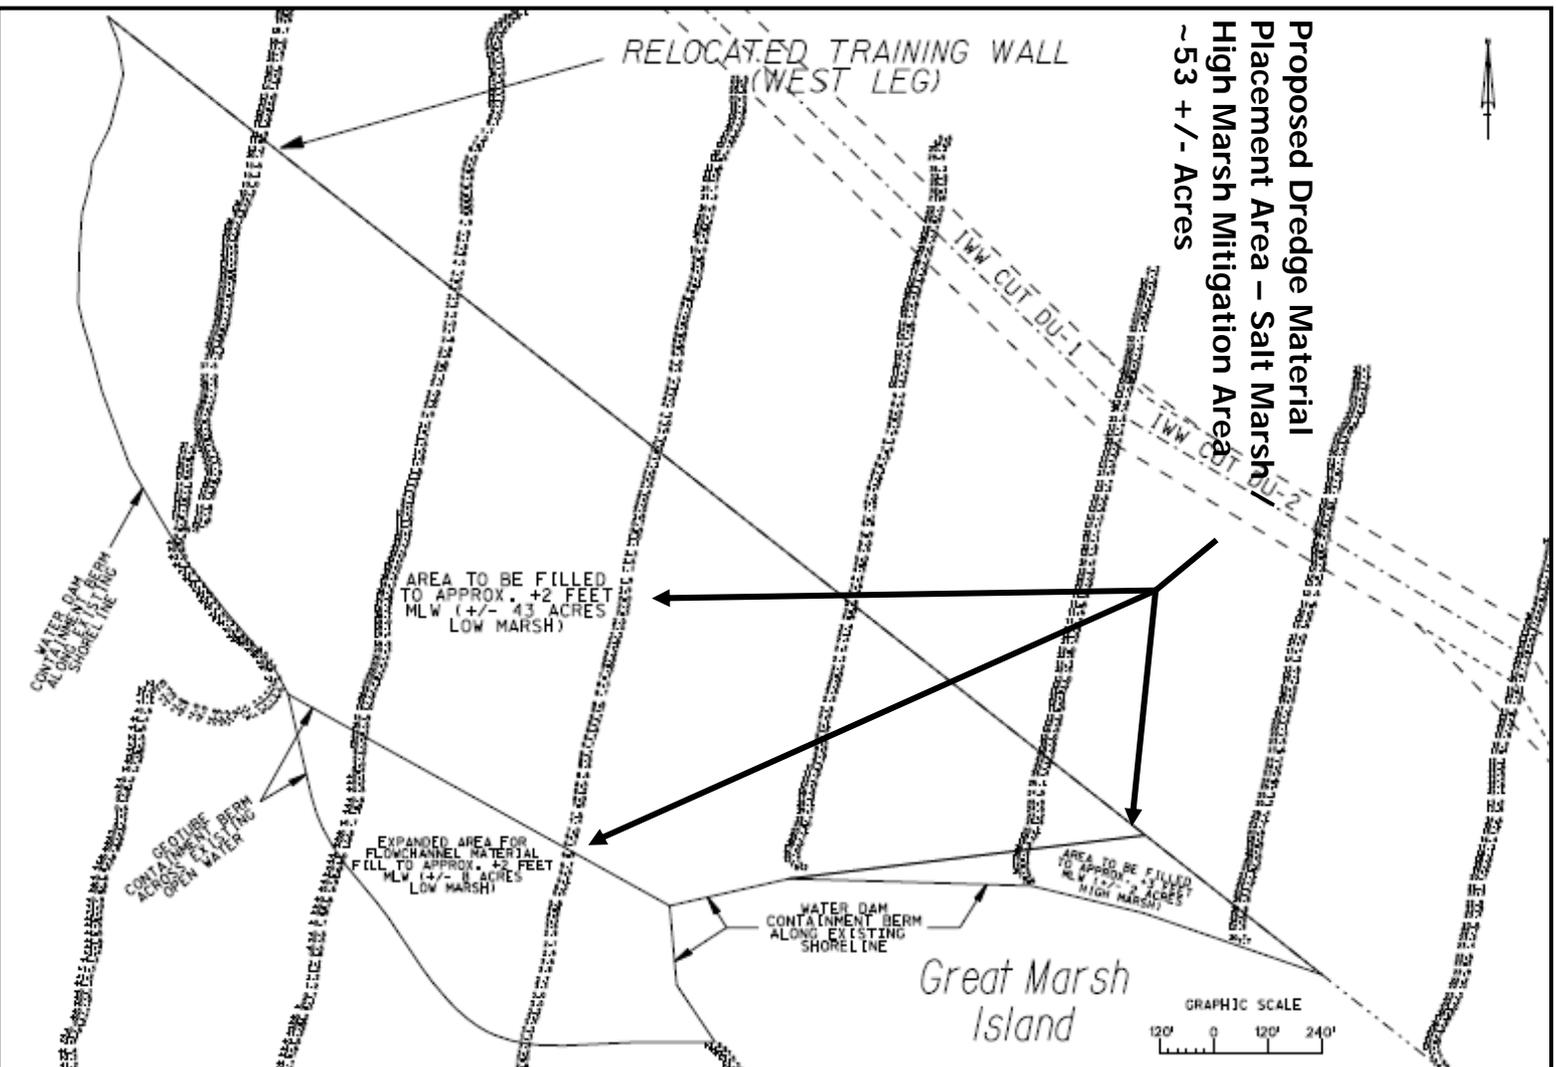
PROPOSED MODIFIED ALTERNATIVE 3B MITIGATION PLAN
